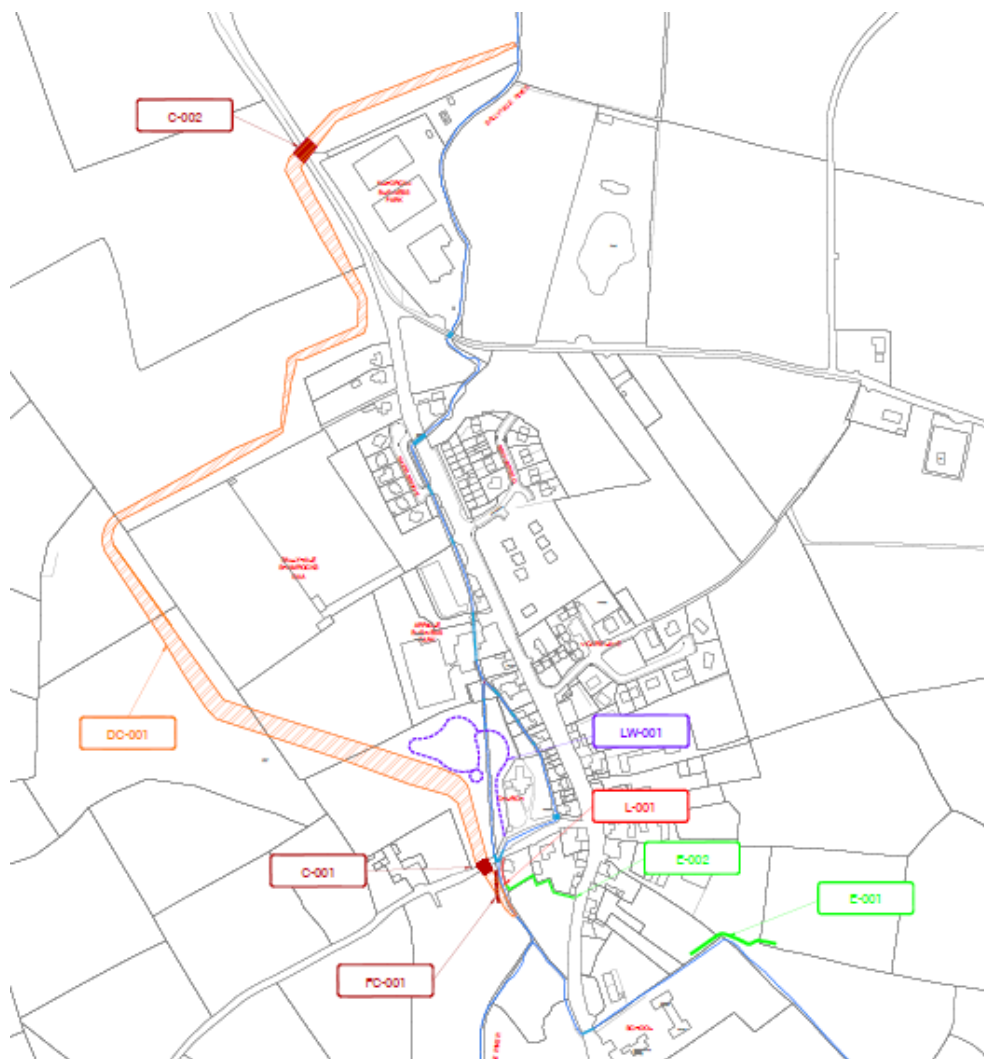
Concept Option C Layout (Refer to Appendix 4.4 for Additional Info)
